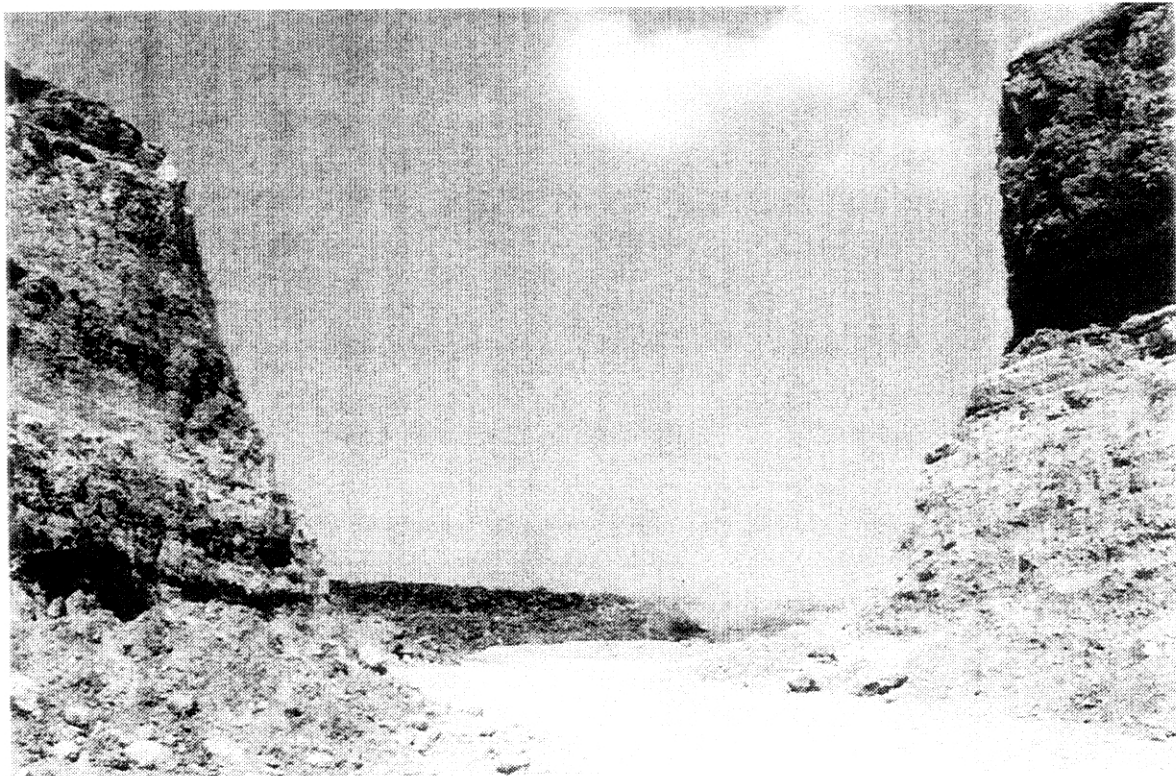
Excavated Lands and Waste Dumping in the Proposed Site
